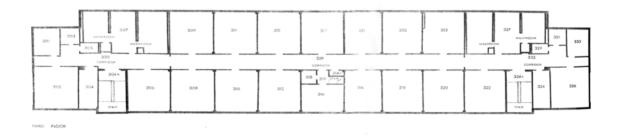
Building 1092, Third floor plan. (Courtesy DND, 2005)
